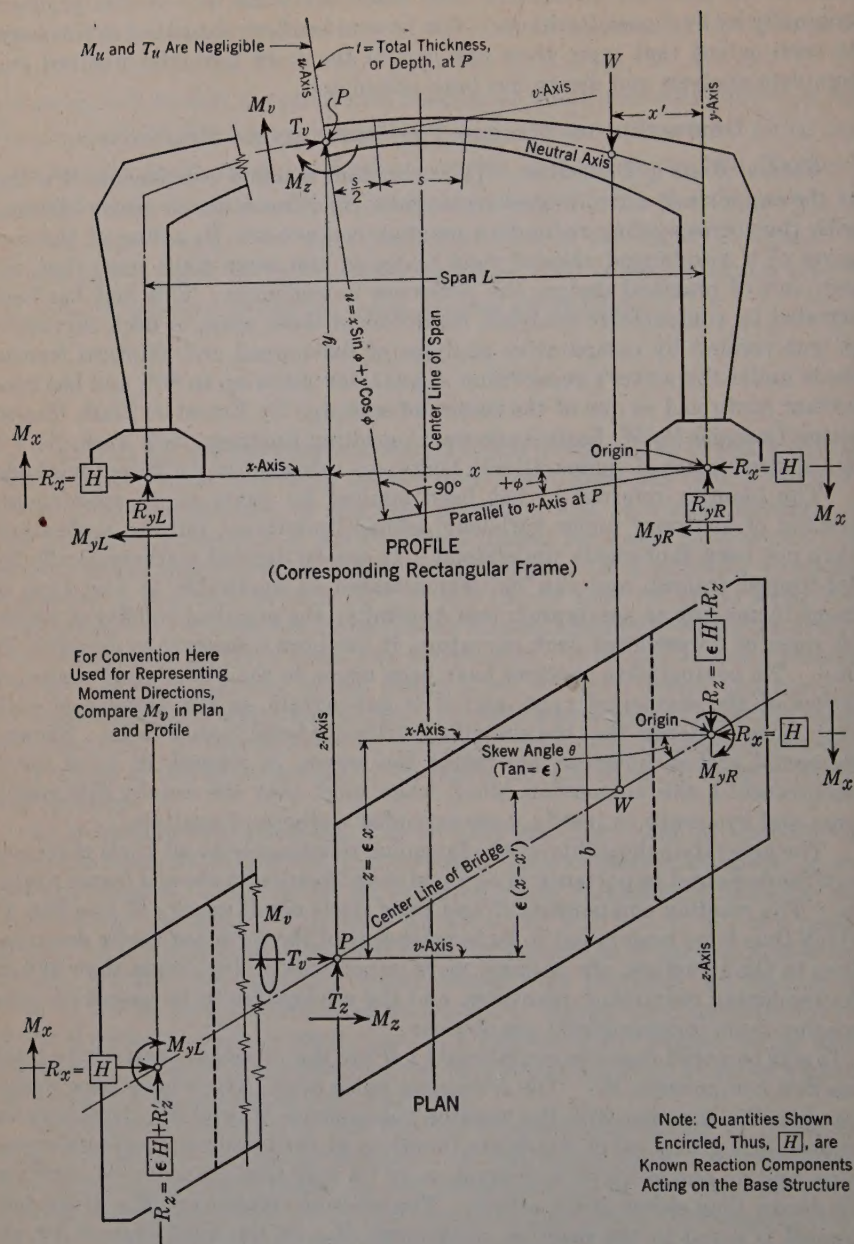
GEOMETRICAL PROPERTIES AND FORCES ACTING (VERTICAL LOADING)
